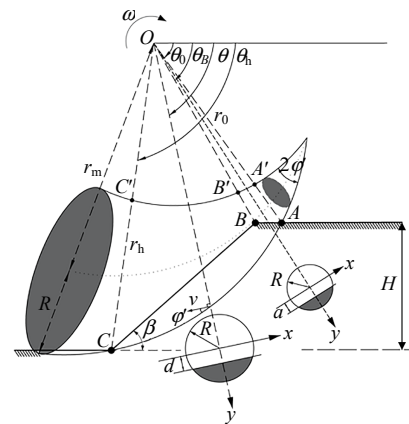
Three-dimensional failure model with a ‘horn-shape’ surface
